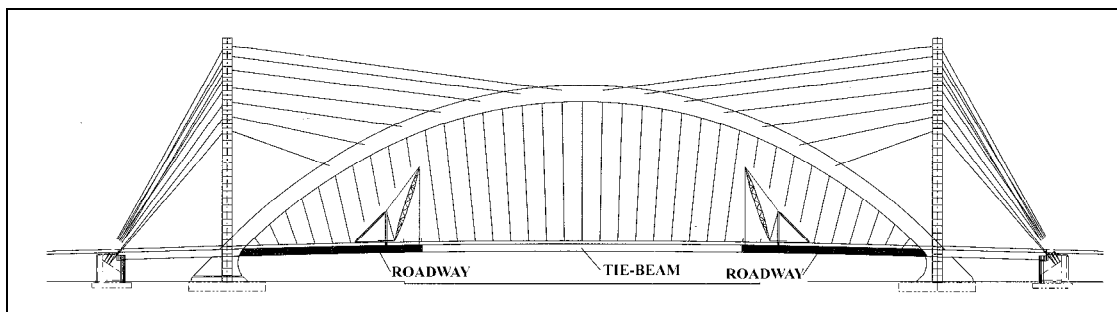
Step-6 Erect Main Span Deck (Modified IRIB Specifications and Construction Plans)
